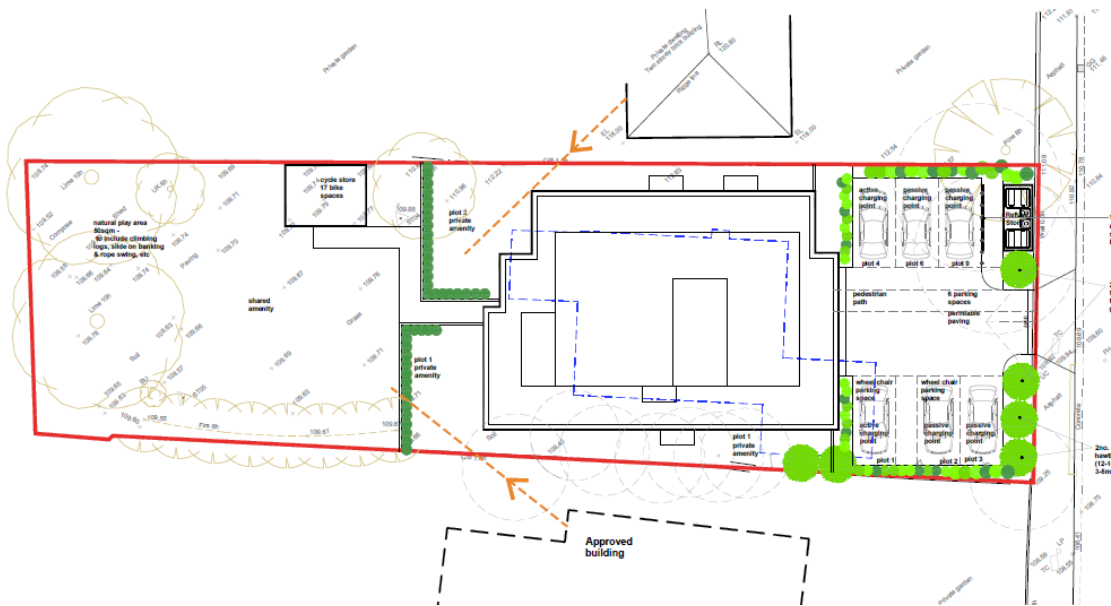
Proposed Block Plan with 1a and 3a West Hill
